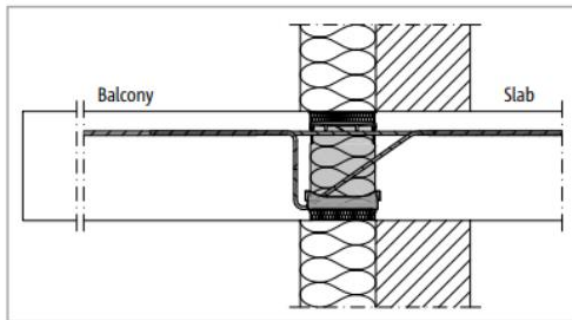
Schöck Isokorb® XT type K: Connection with thermal insulation composite system (TICS)
